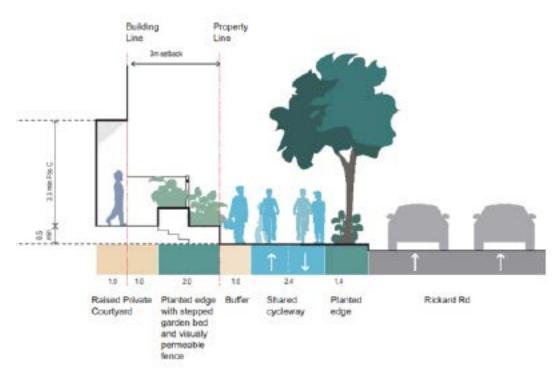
Indicative Ground floor level residential interface to Rickard Road
